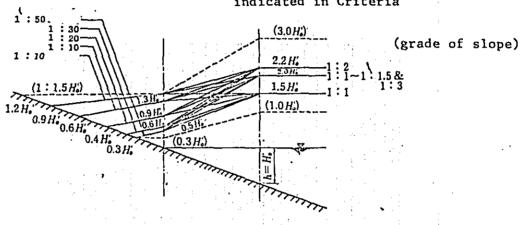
BOTTOM SLOPE AND CROWN ELEVATION
